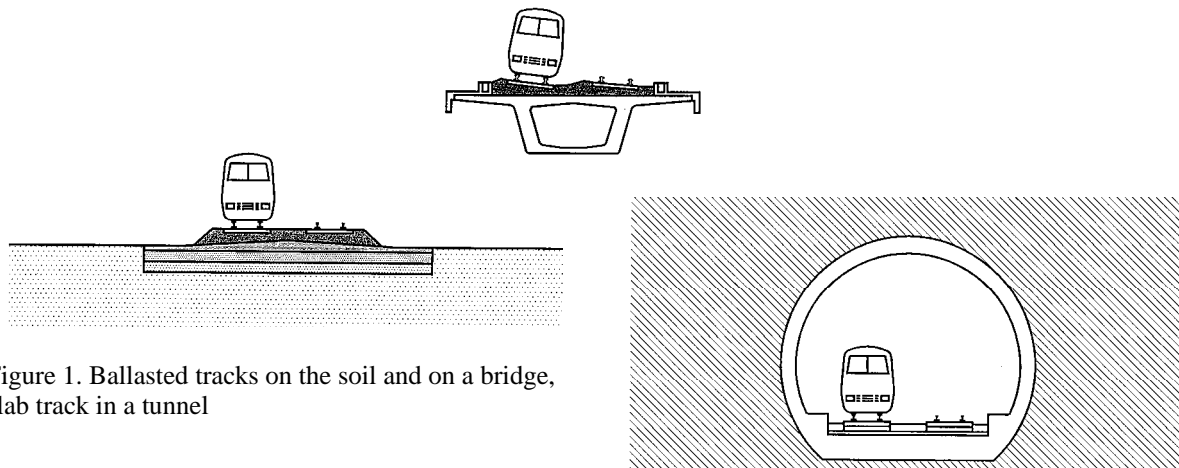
Ballasted tracks on the soil and on a bridge, slab track in a tunnel
